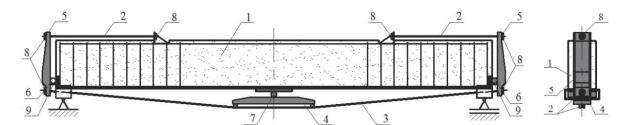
General view of a reinforced concrete beam with a lever-rod system:
